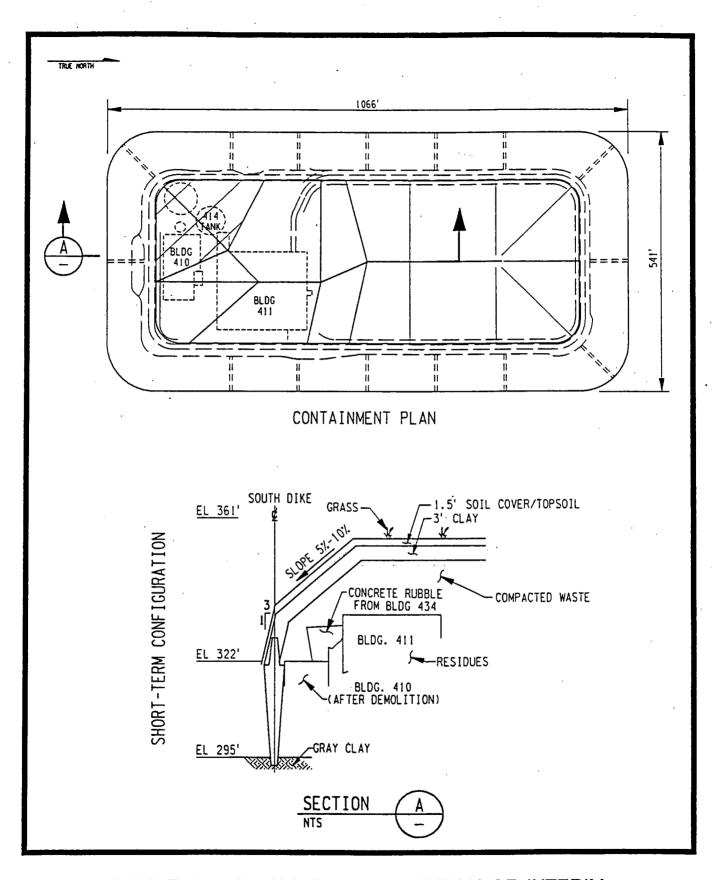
PLAN VIEW AND SECTION OF INTERIM WASTE CONTAINMENT FACILITY
